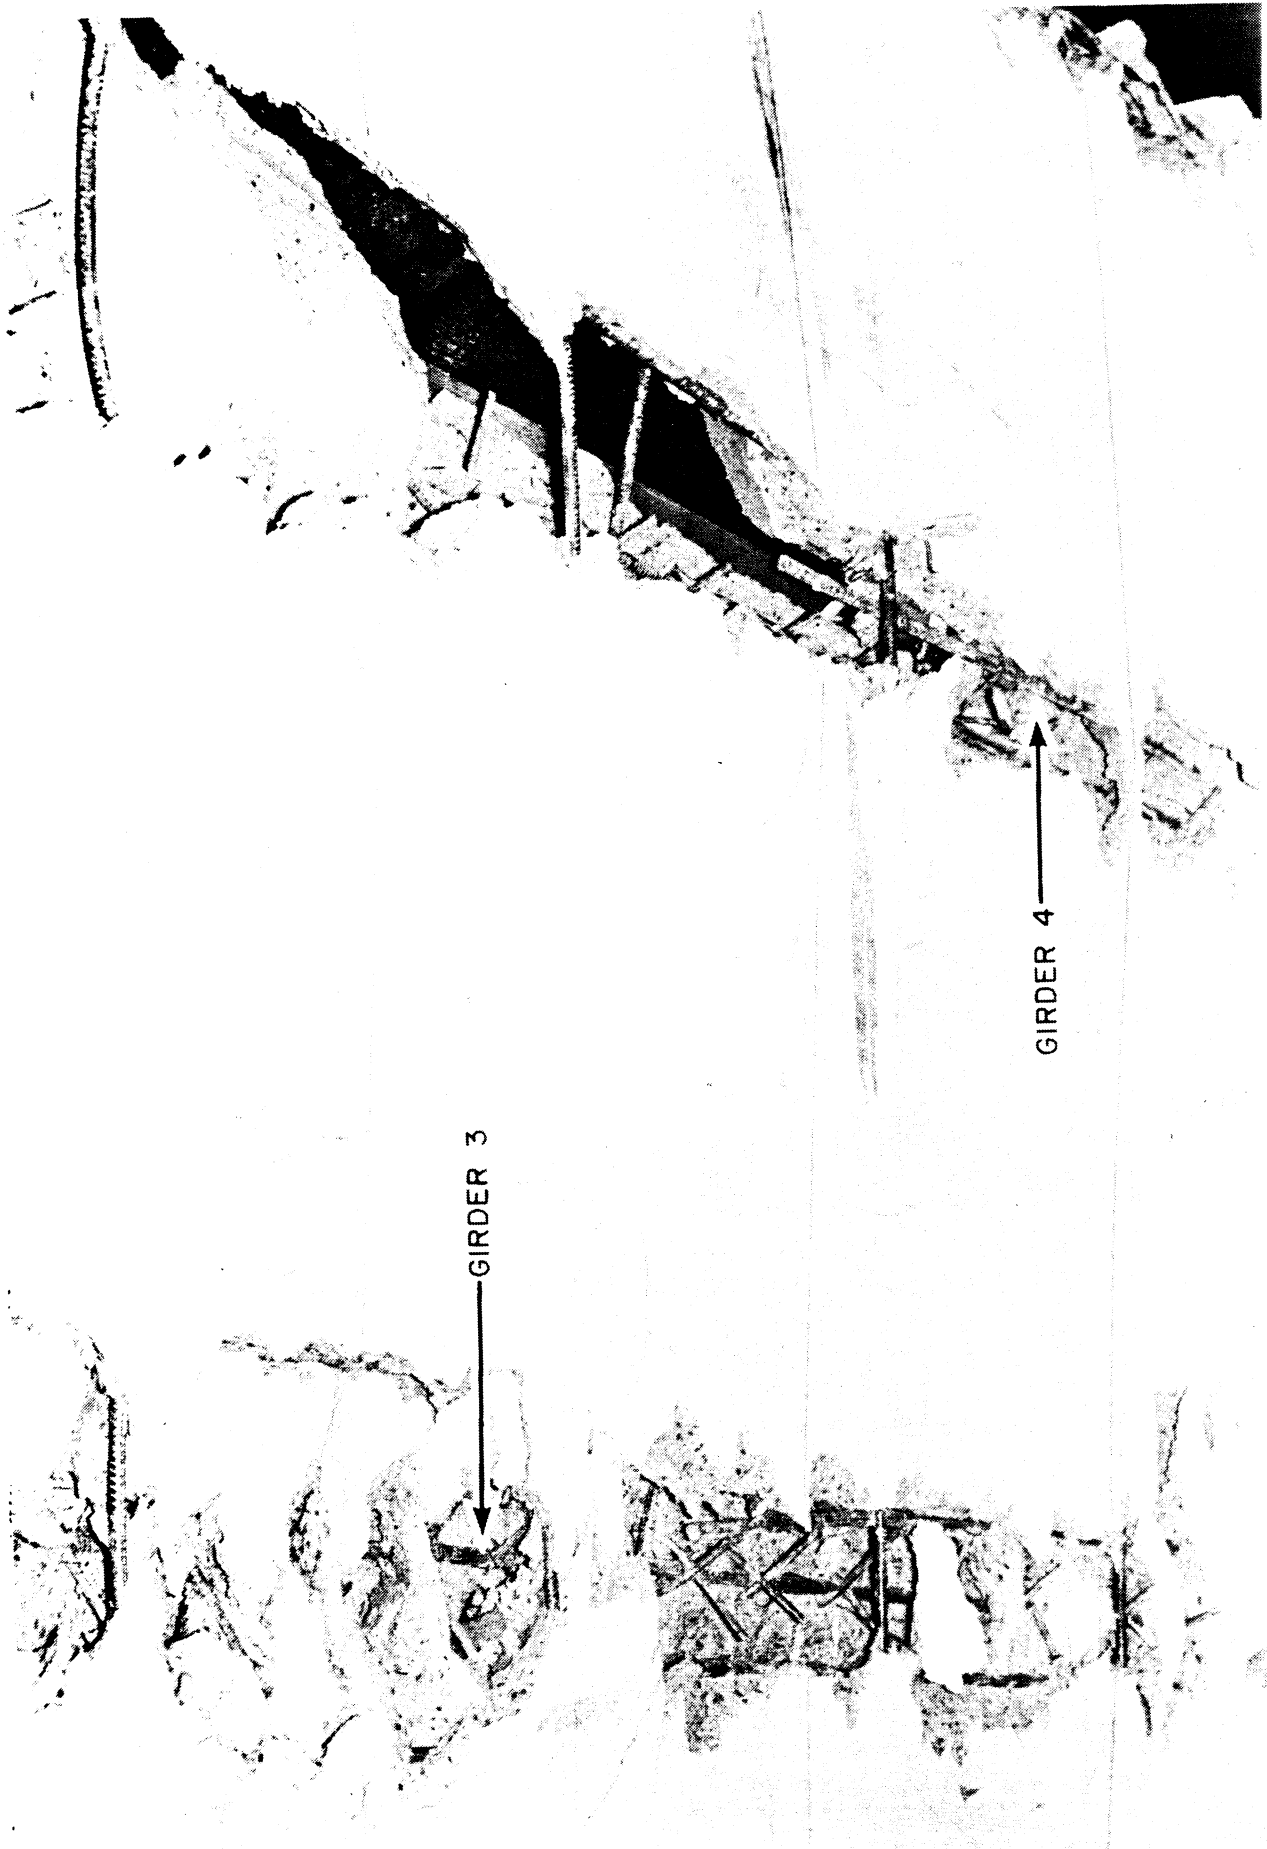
VIEW OF BOTTOM SLAB AT END OF THIRD LOADING CYCLE SHOWING LARGE CRACKS AND PUNCHING FAILURE ALONG BOTTOM OF GIRDER WEBS 3 AND 4 NEAR SECTION X
